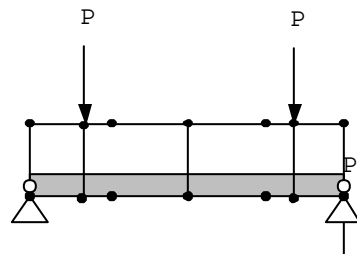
Illustration of 1-Span Bridge Chord, Rods are Hinge Elements, 2-Point Load Beam Model
